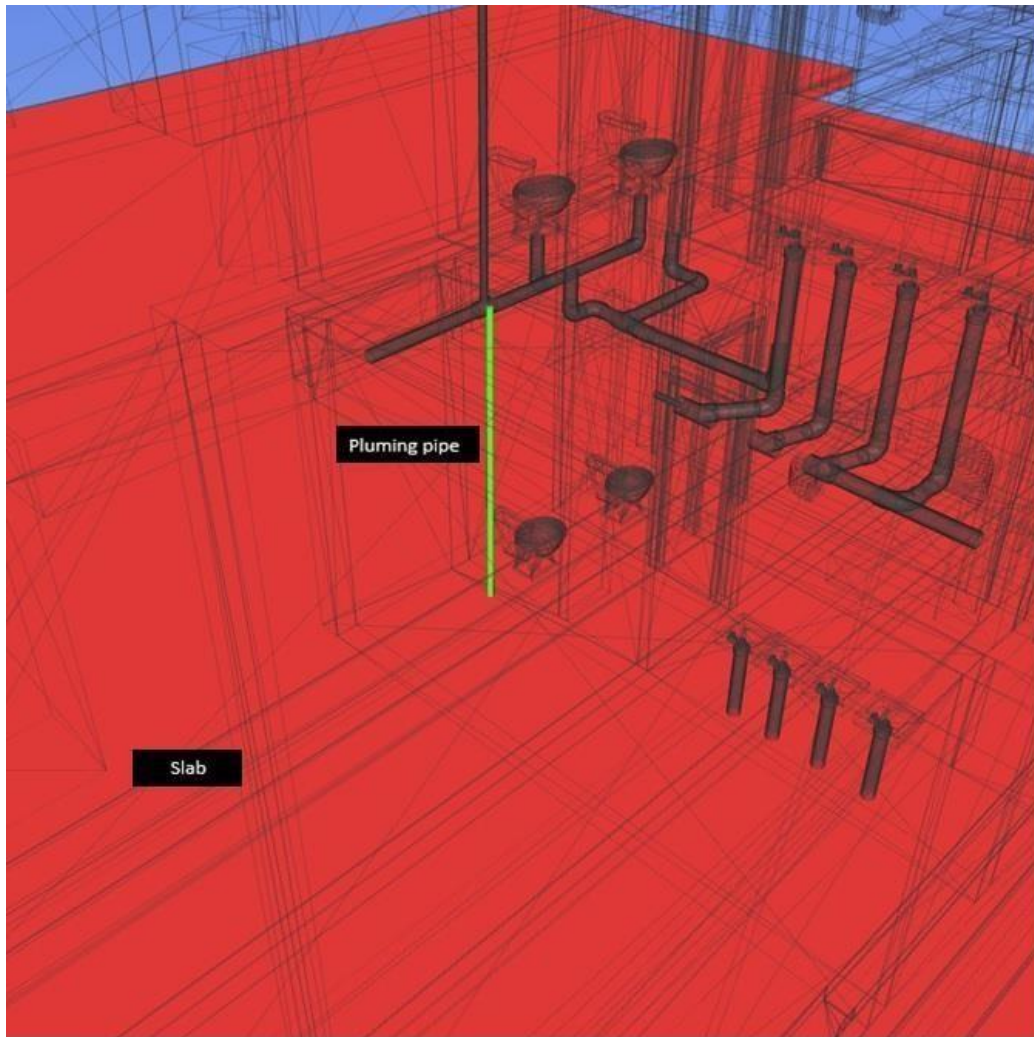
Clash between Slab and Plumbing pipe on 6th floor.
